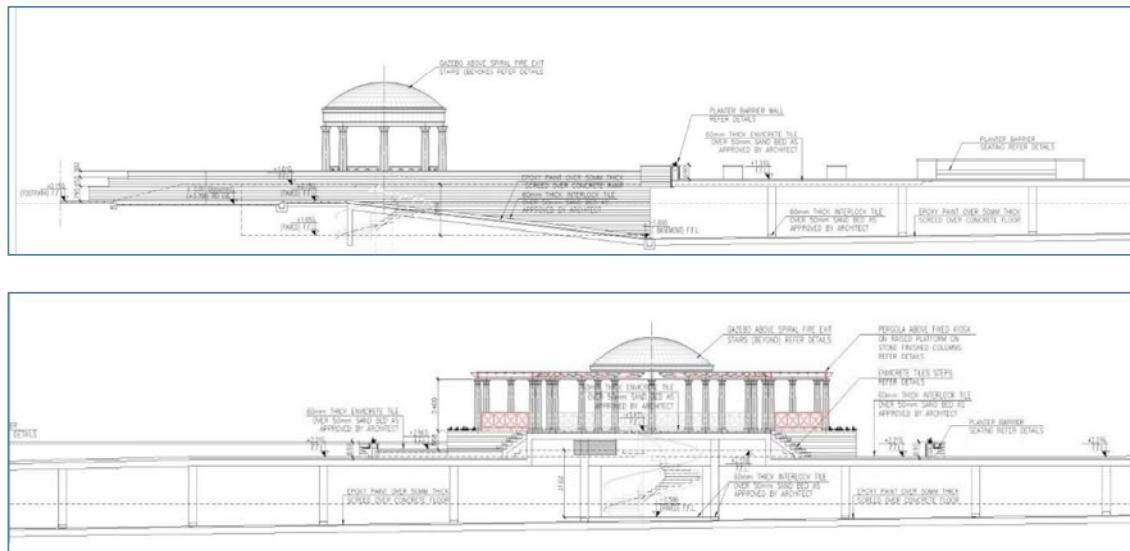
Vertical view of basement parking (level 1) plan at Shahrah-e-Kamal
